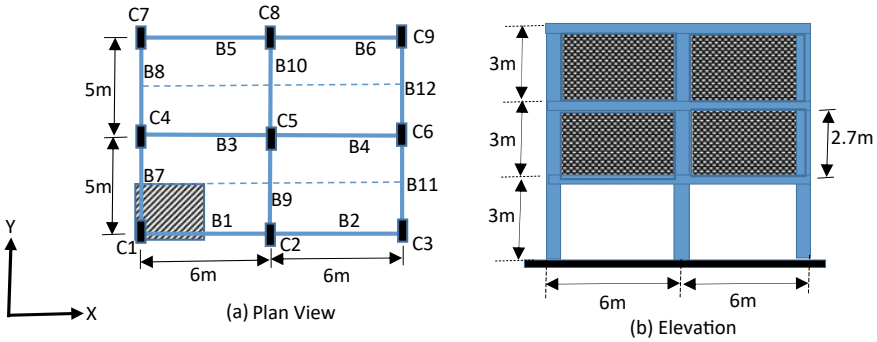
Plan view and elevation view of a typical 3-storey building: a Plan, and b Elevation
